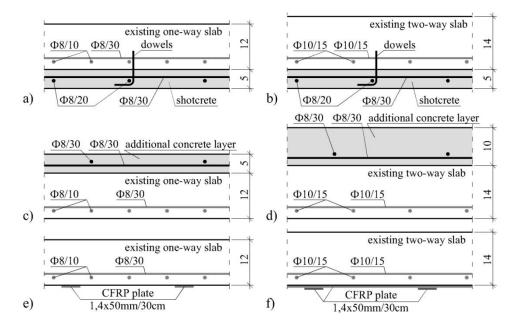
Cross-sections of the strengthened slabs: a) one-way slab with shotcrete; b) two-way slab with shorcrete; c) one-way slab with additional concrete layer; d) two-way slab with additional concrete layer; e) one-way slab with carbon fibre reinforced polymer; f) two-way slab with carbon fibre reinforced polymer.
